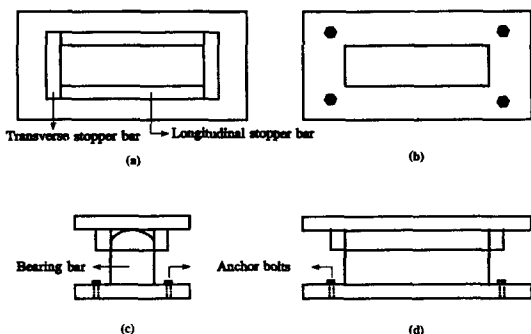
Typical Fixed Sliding Bearing: (a) Top Plate; (b) Bottom Plate Plan View; (c) Side View of Bearing; (d) Front View of Bearing
